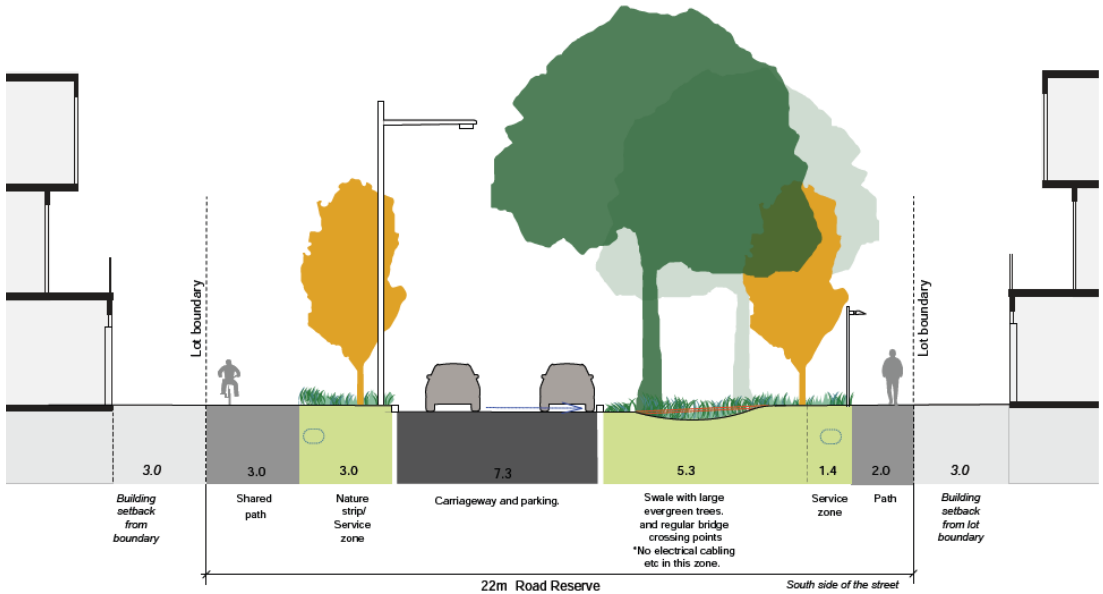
East West Street with raingardens dispersed at each street corner and centre of block
